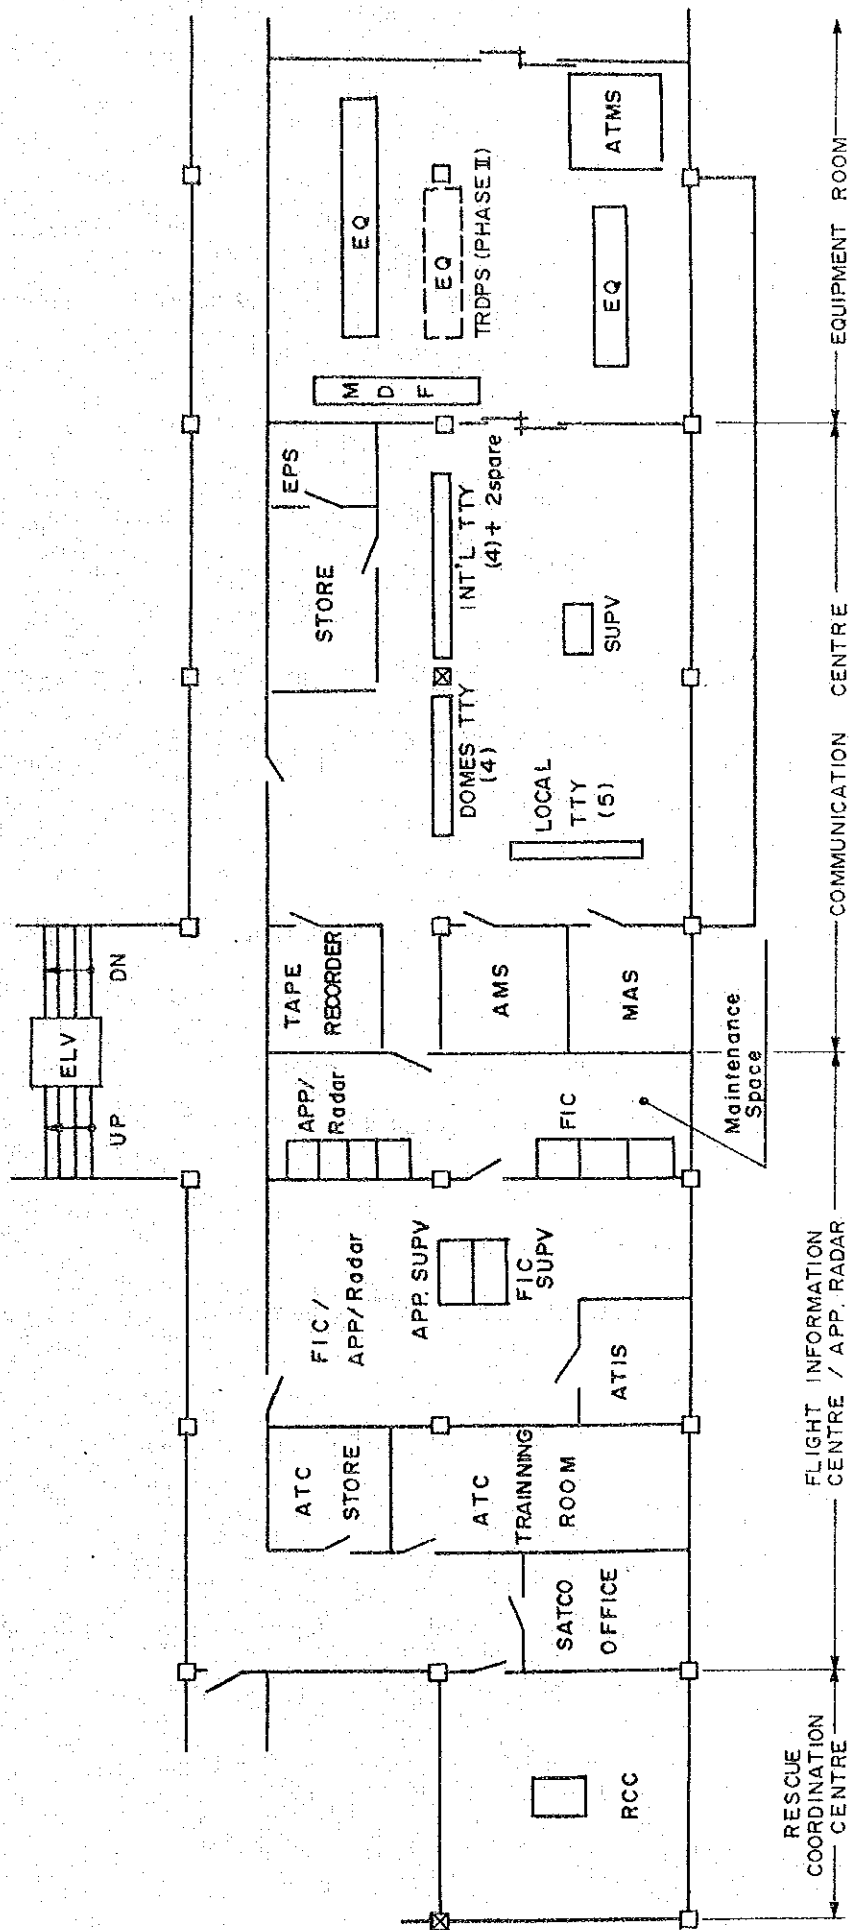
Floor Layout Plan of Flight Information Centre and Communication Centre, etc. (2nd Floor of Control Building)
